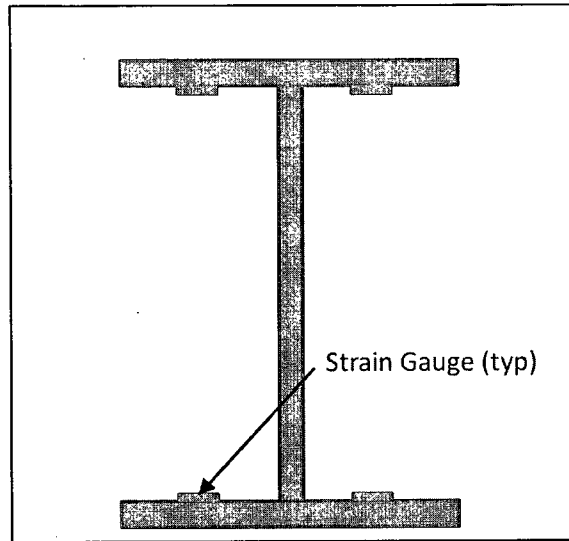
Typical strain gauge locations on top and bottom girder flanges (depiction is of an interior girder)
